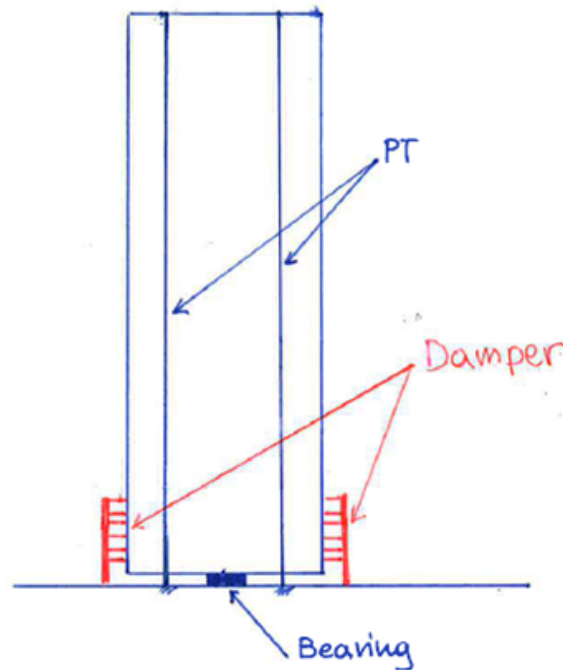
Configuration of unbonded post-tensioned concrete wall with central bearing
